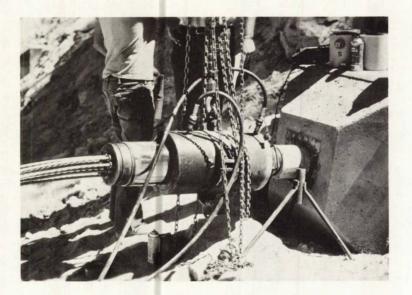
A pre-stressing jack with a load cell between the jack and the bearing plate. A second load cell can be seen on top of the concrete bearing block.
